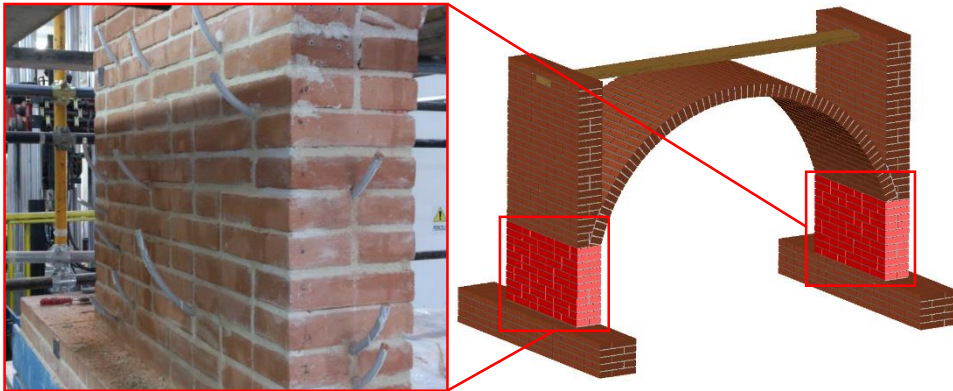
Repointing of the cracked joints and grout injections system on the abutments (lower portion).
